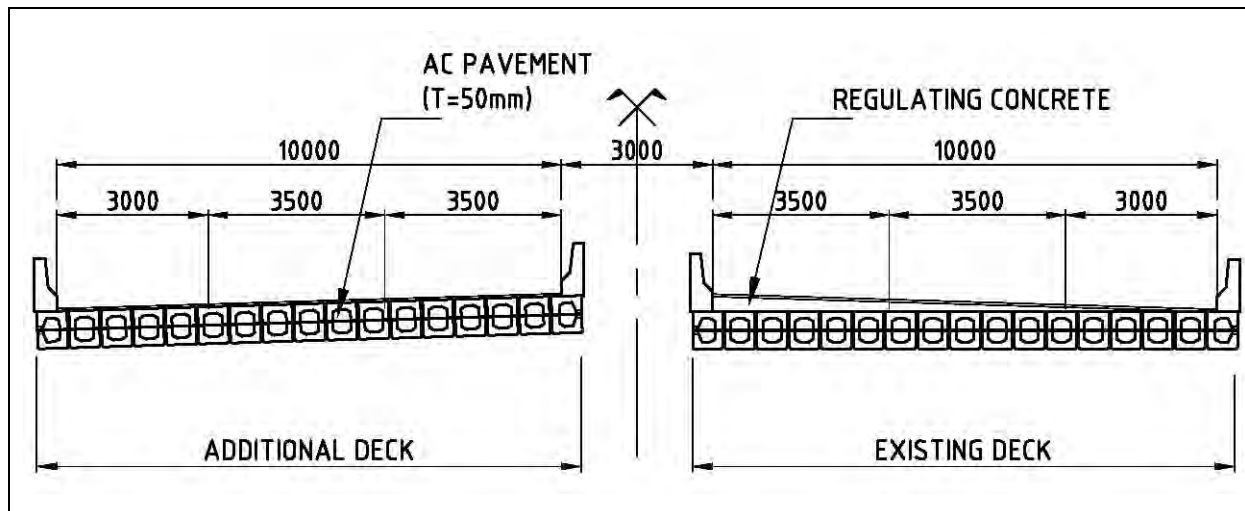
Typical Cross-Sections of Additional Bridge Deck for Full 4-Lane
